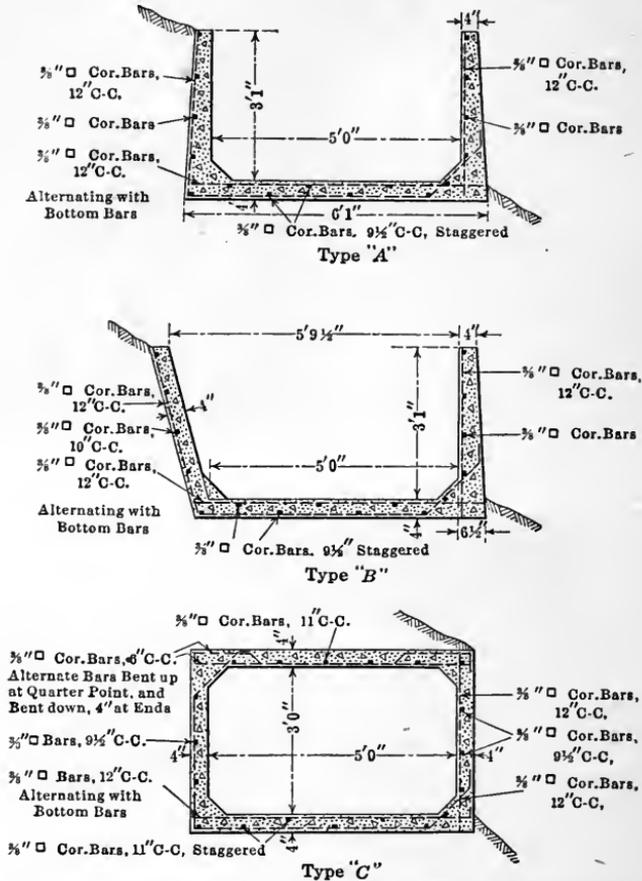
Reinforced concrete bench flumes. Yakima Valley Canal Co., Wash.
